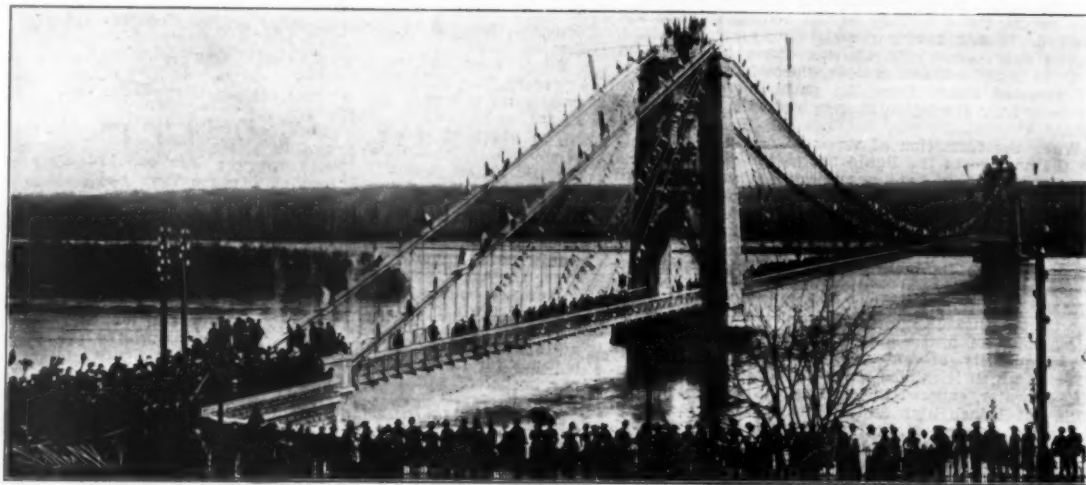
THE SUSPENSION BRIDGE AT VERNAILSON ON THE OPENING DAY.
